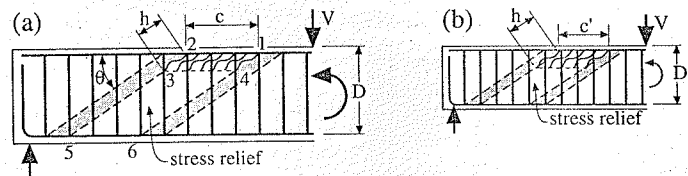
Stress relief zones caused by a crack band propagating across the compression strut in beams of different sizes with stirrups. The beam in (b) is similar to the beam in (a) except that the crack band width  $h$  is the same.
